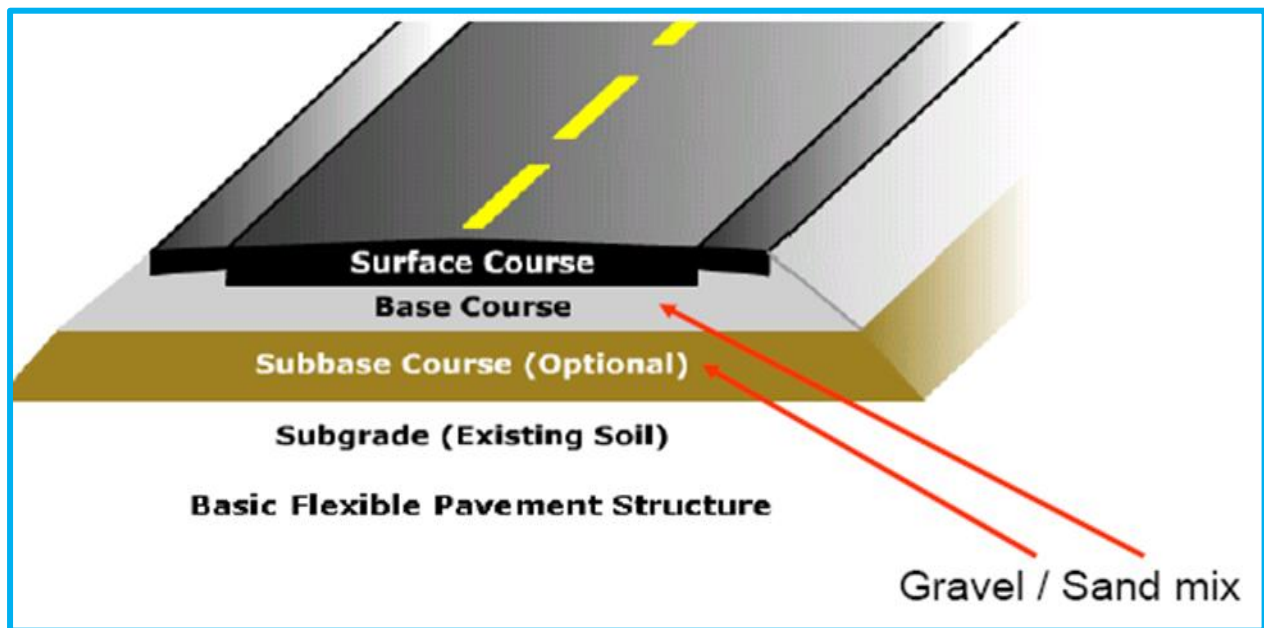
Basic Flexible Pavement Structure (www.loadpavement.com)
